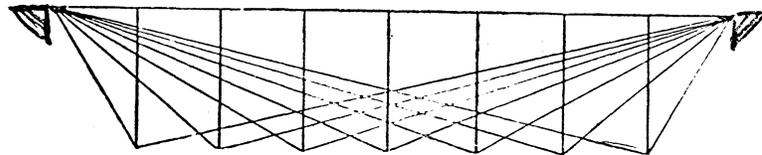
Wendel Bollman's suspended truss patented in 1852. (From Bridge Engineering, James A. L. Waddell, p. 473.)
